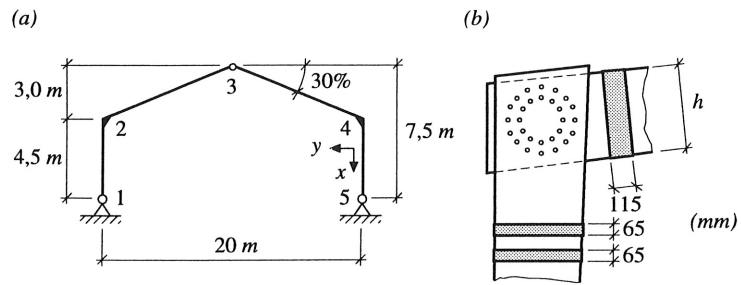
Geometry of the frame (a) and layout of the frame corner (b).
